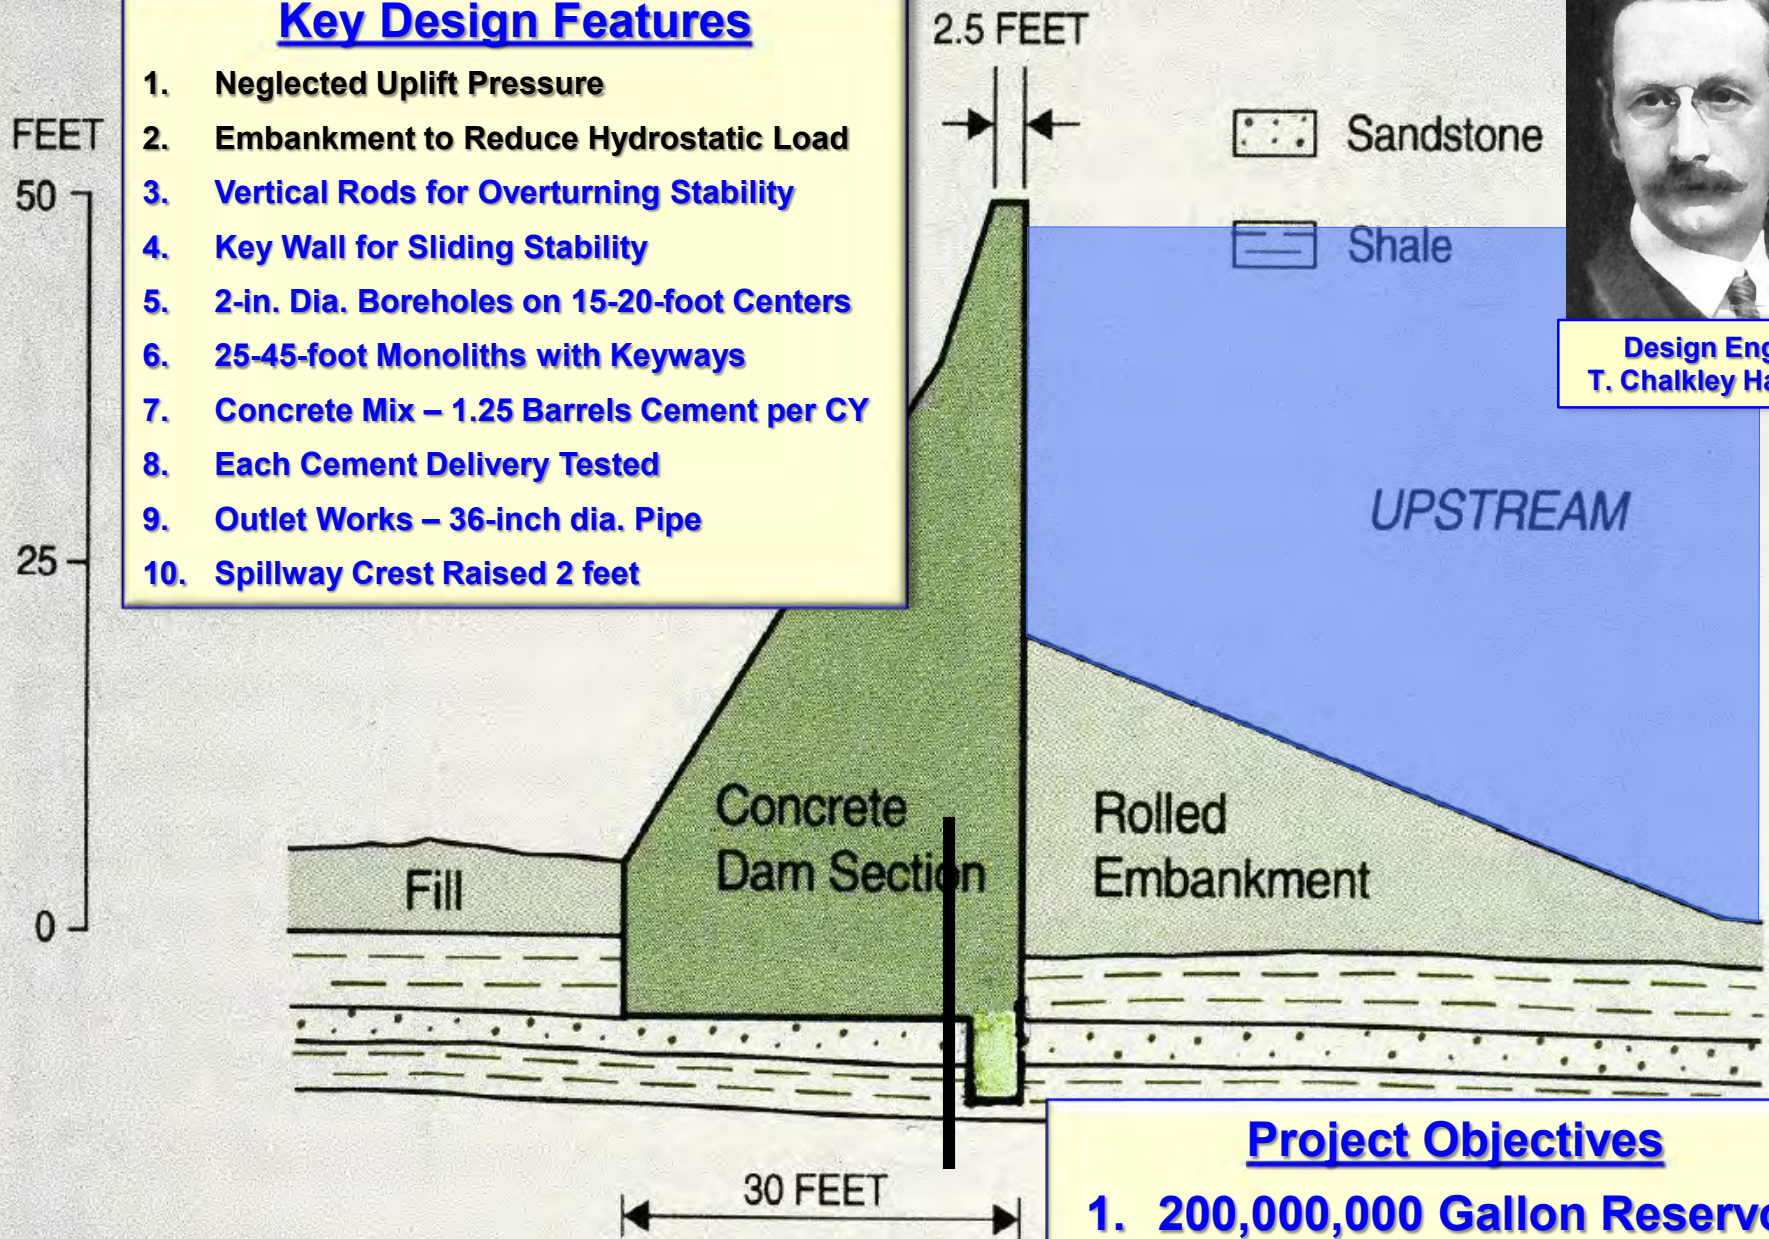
Prefailure cross section of Austin Dam at Block "D."
